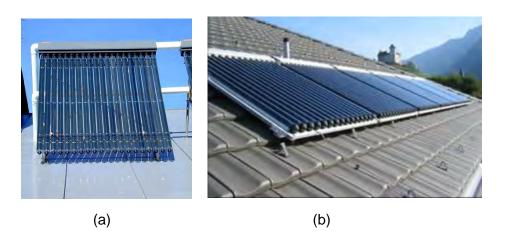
Evacuated tube solar collector on building roofs (a) Flat roof; (b) Sloping roof
